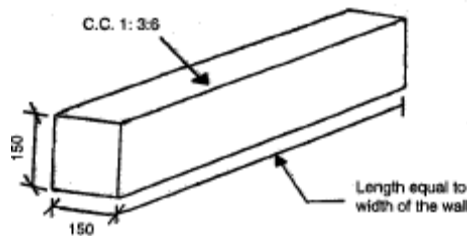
Concrete Bond Stone with C.C. 1: 3: 6 (However it is advisable to use 6 mm dia. longitudinal bars 4 Nos. with 6 mm stirrups at 150 mm c/c)
